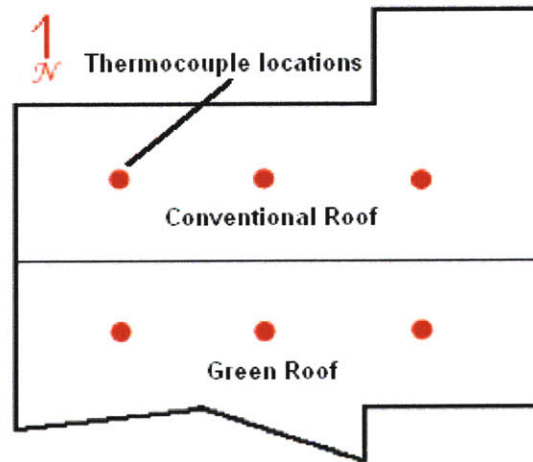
Roof diagram showing symmetric thermocouple placement on both green and conventional roofs. Source [35]
